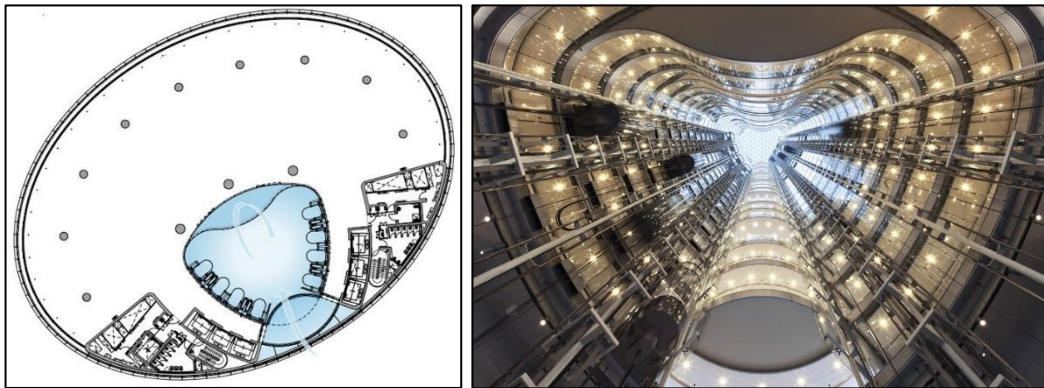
a) Plan of the building & wind direction and sun path diagram, b) View of central air shaft/atrium (A. Wood & Salib, 2013)
